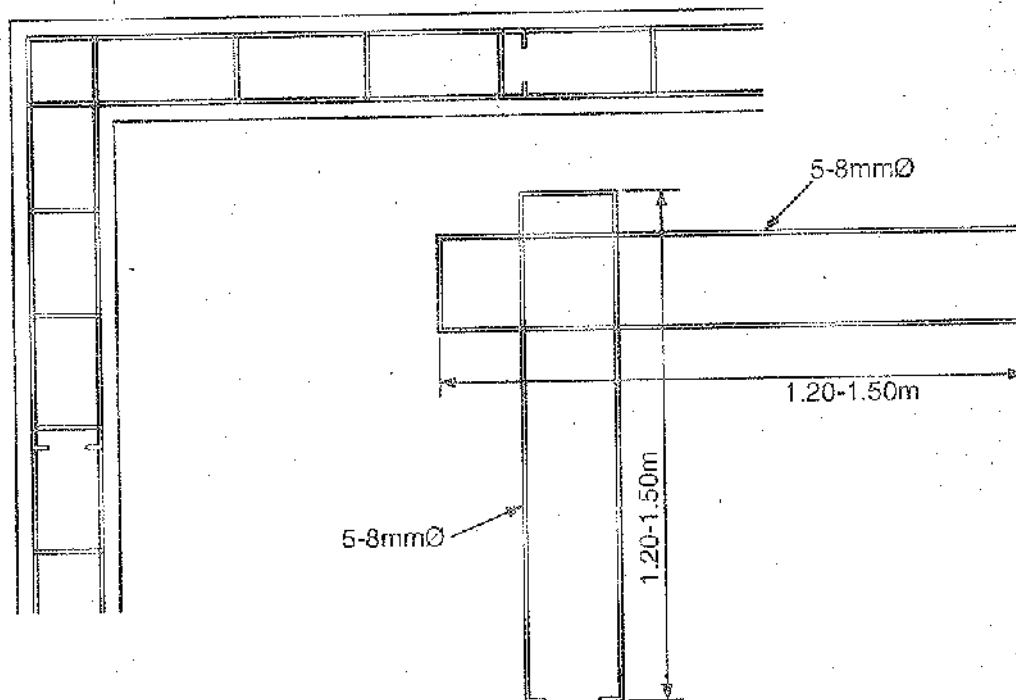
Dowel bars at corners and T-junction all sill level of windows
